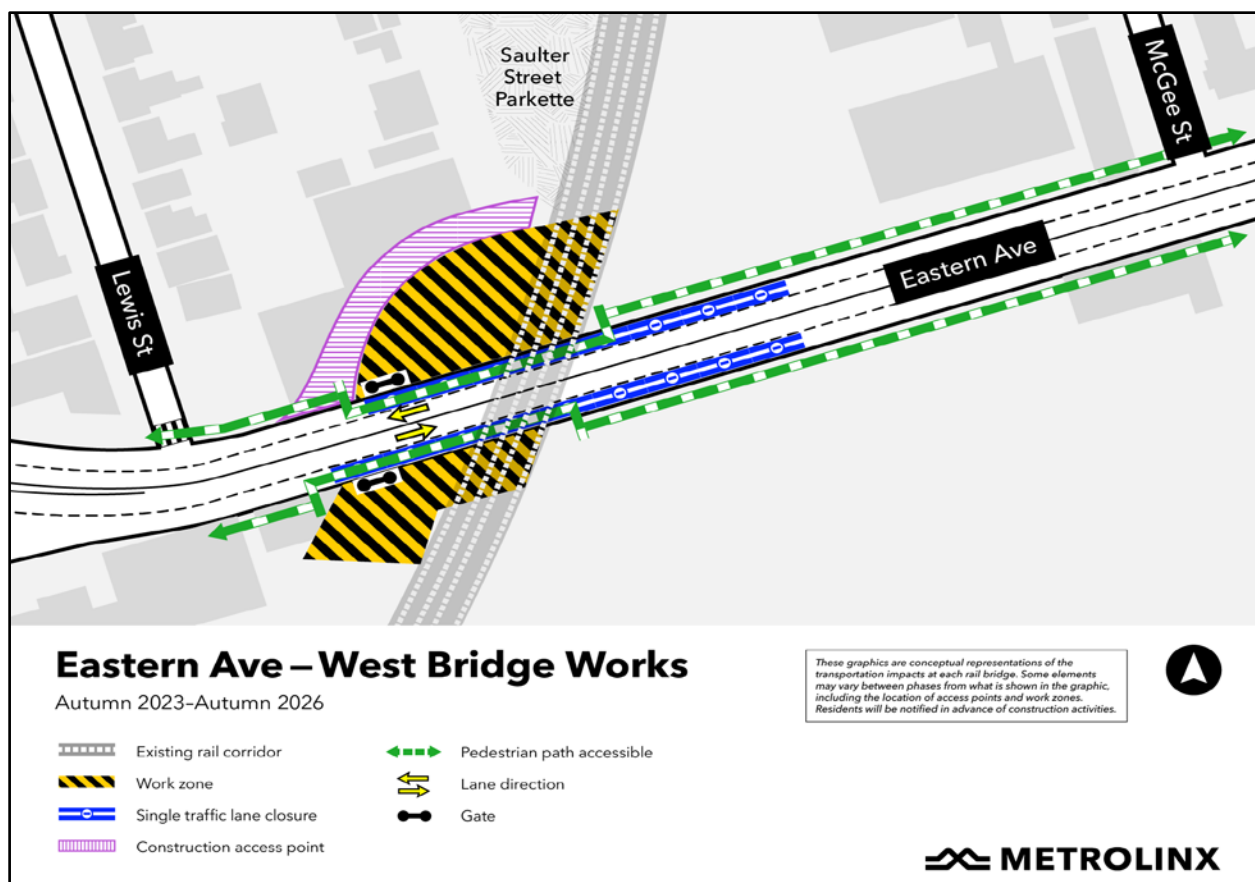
Eastern Avenue Traffic Management during West Side Bridge Structure Works Source: Metrolinx
